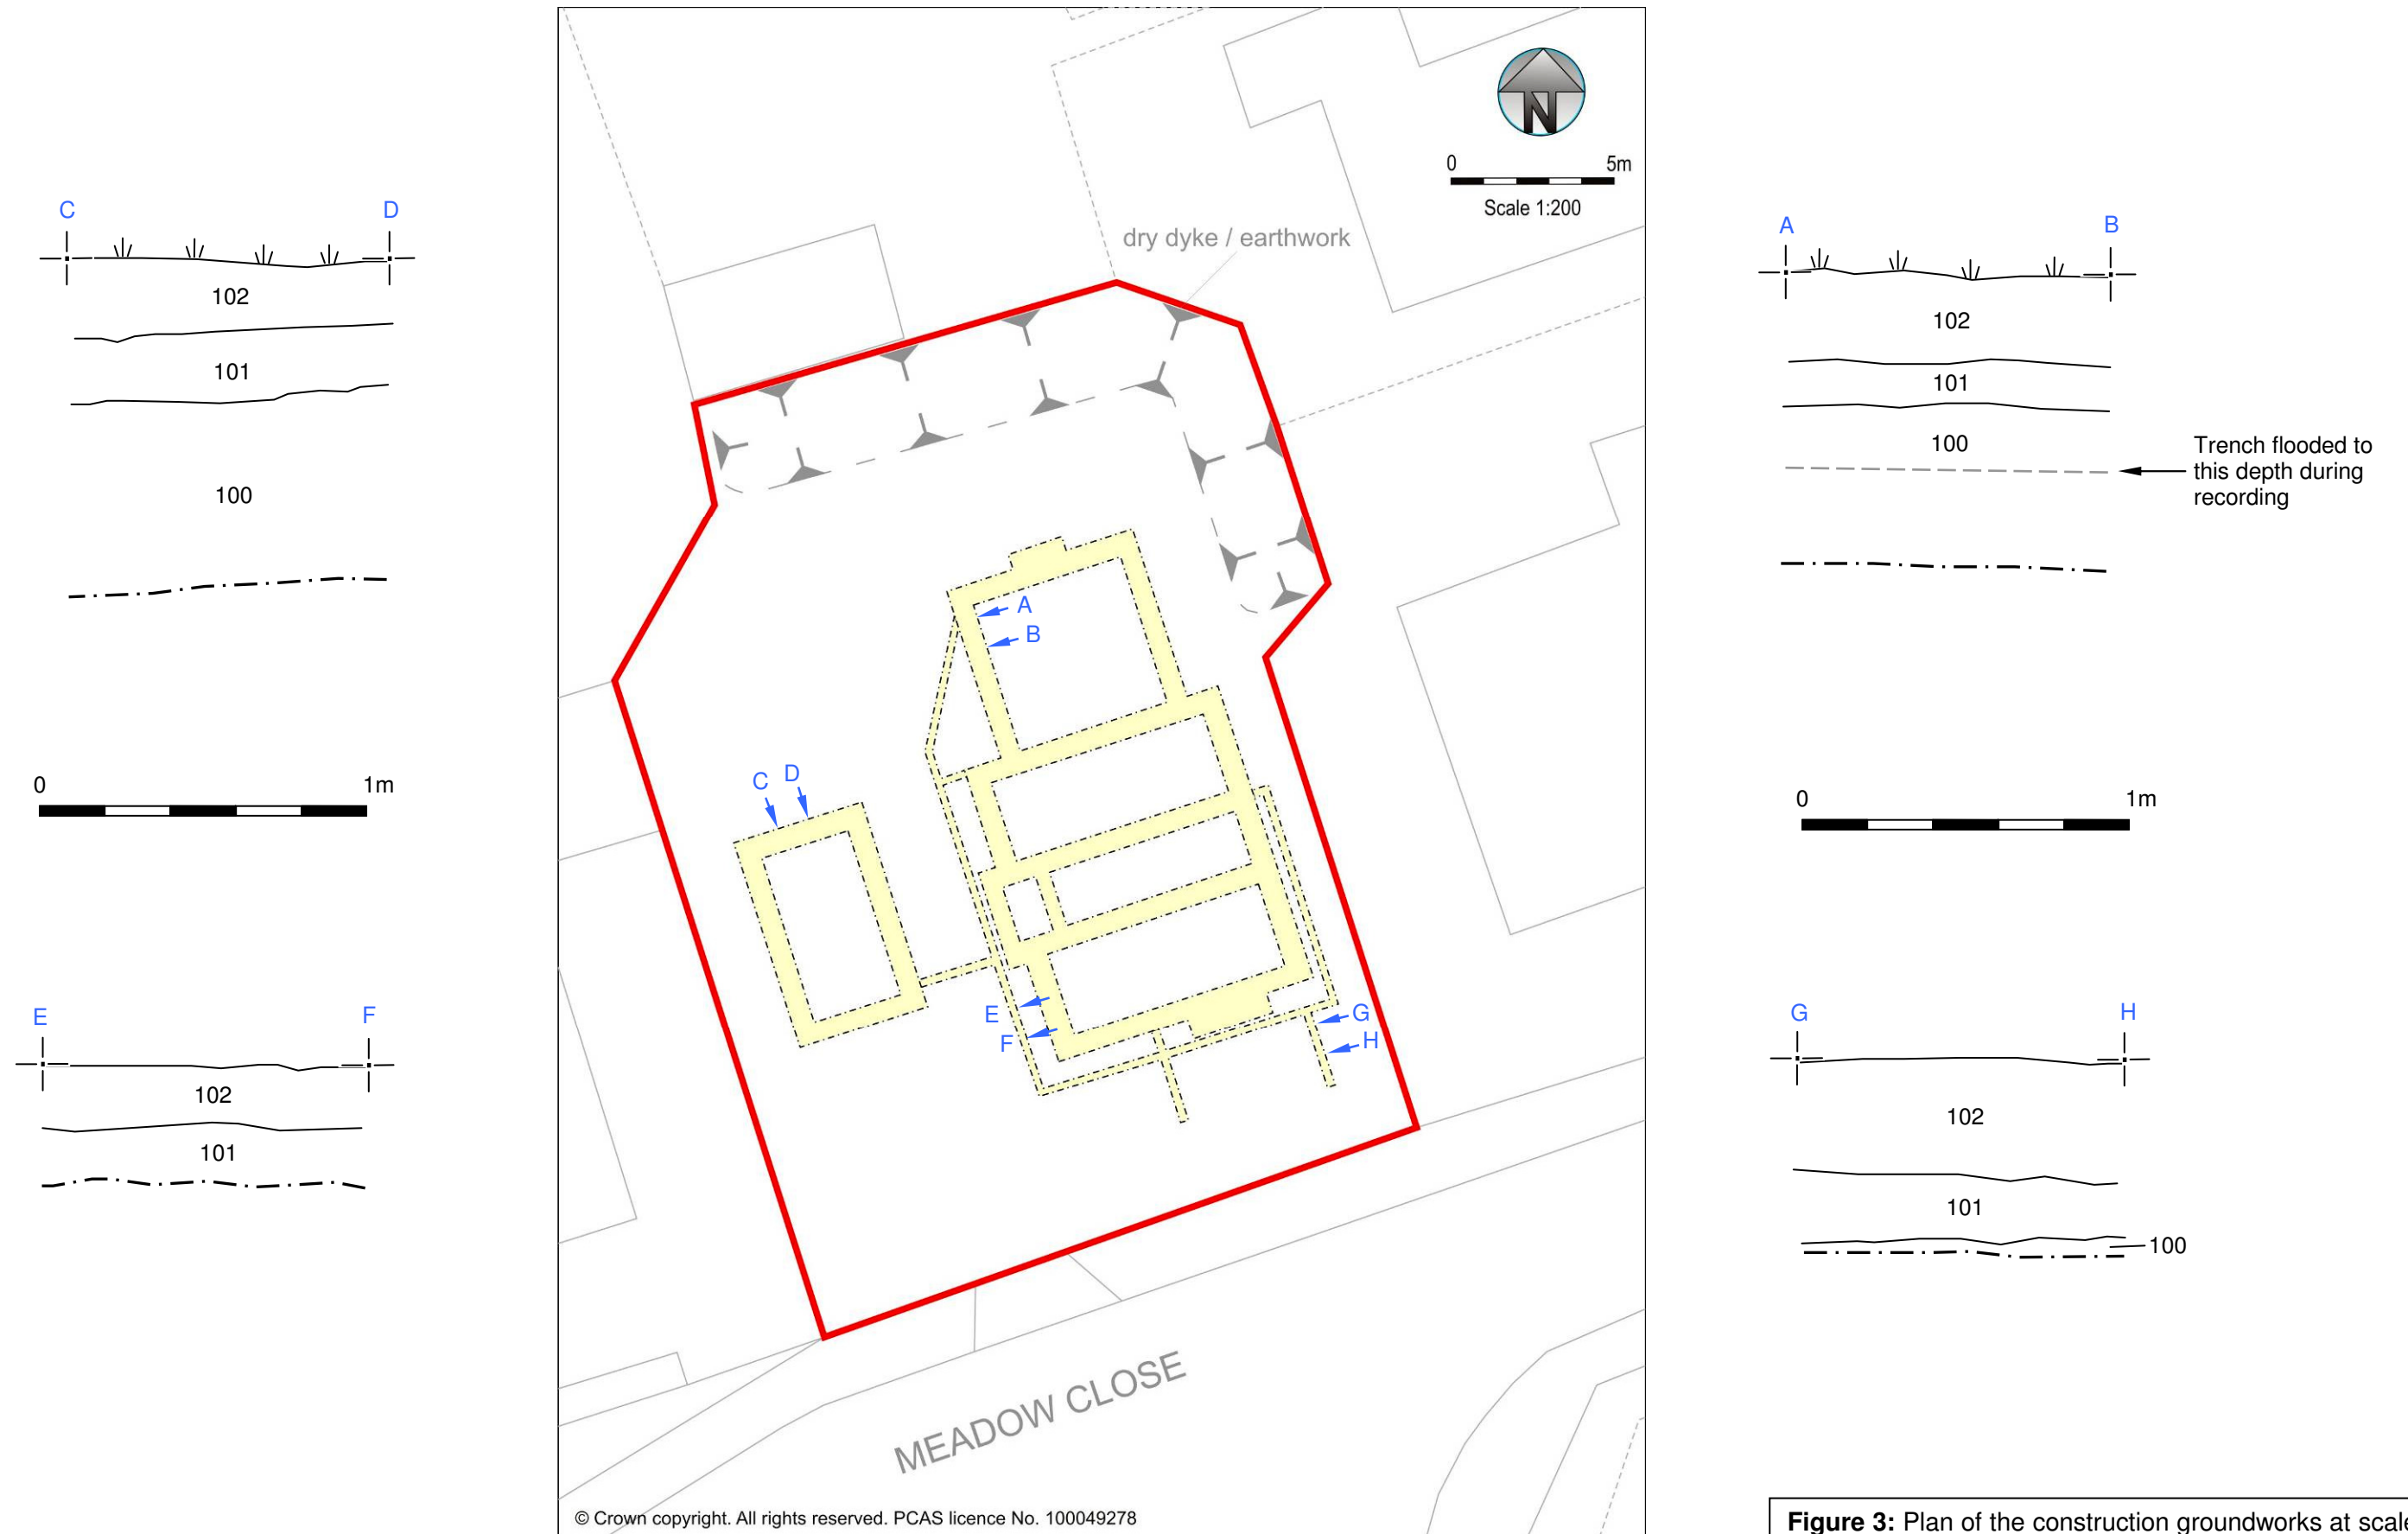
Plan of the construction groundworks at scale 1:200, showing the monitored excavation trenches (shaded yellow), with sample sections at scale 1:20. The application area is outlined in red, and the drawn sections are located on the main plan with blue arrows.
